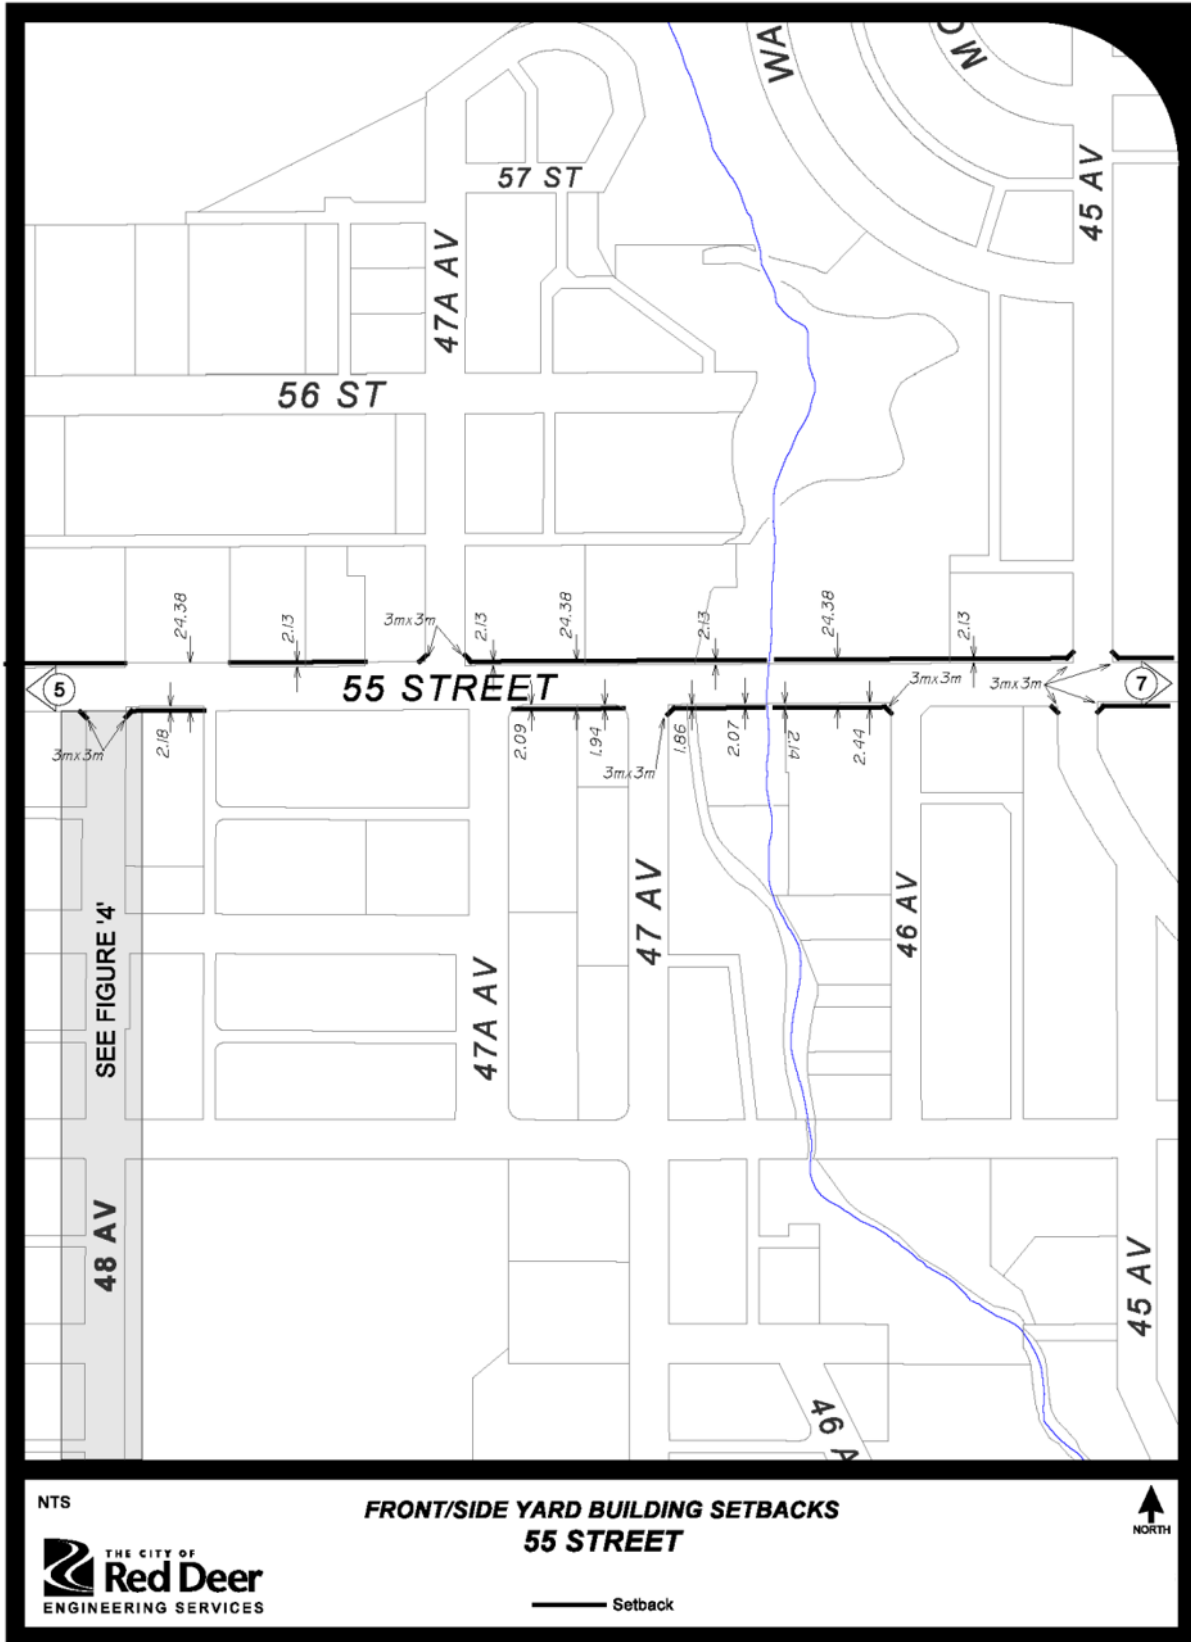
Front and Side Yard Building Setbacks - 55 St (1)
